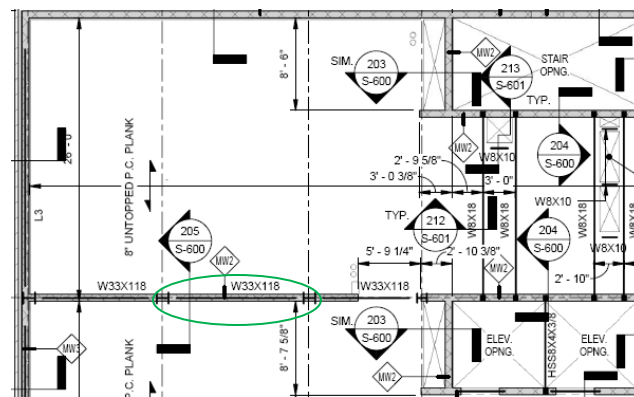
Second Floor Plan Transfer Beam Spot Check Location
